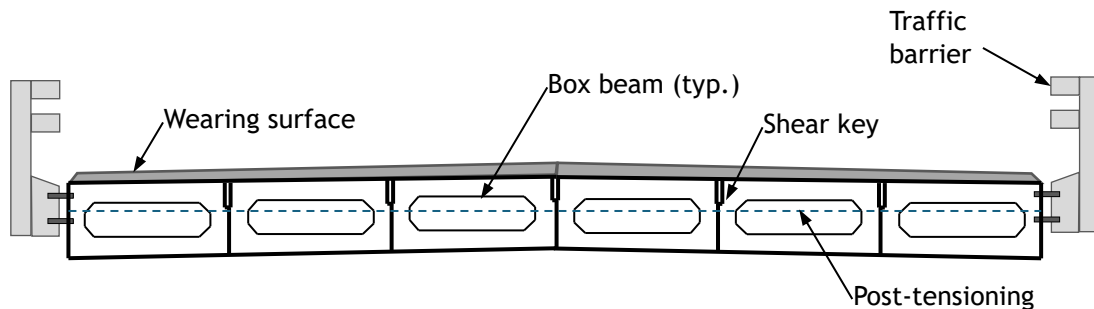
Typical cross section of a prestressed precast adjacent box beam bridge.
